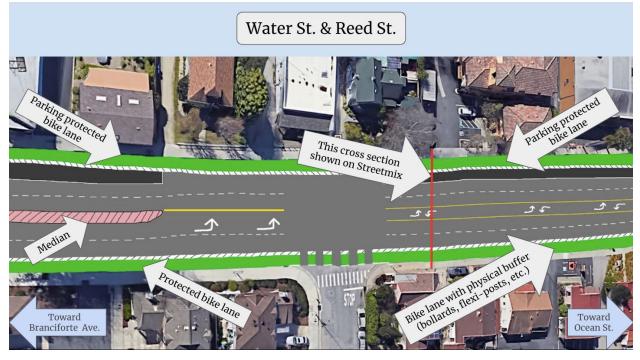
Aerial view of the new proposed designs for Water Street at the Reed to Market segment.
